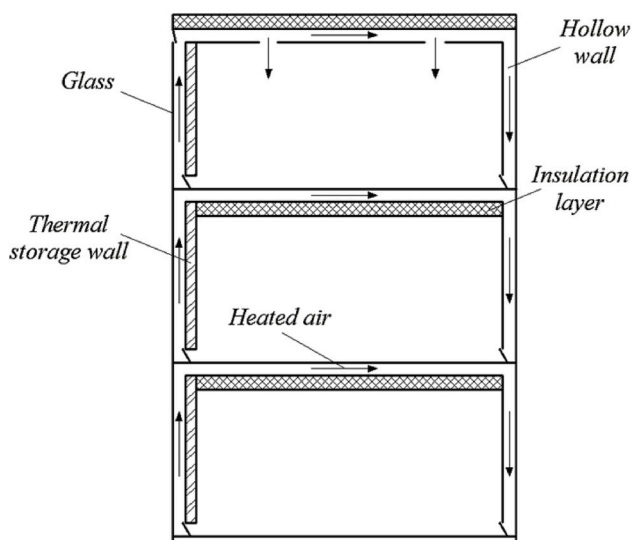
The Trombe wall construction for high-rise buildings [92].
